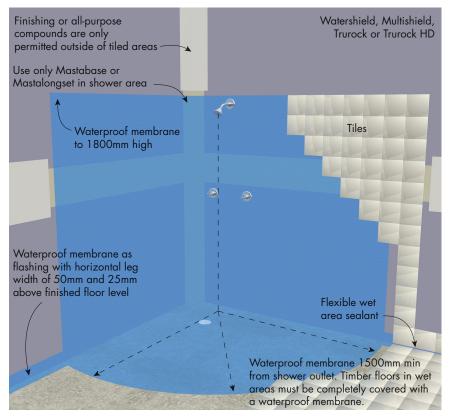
Internal in situ tray for unenclosed shower On concrete or compressed fibre cement floor
